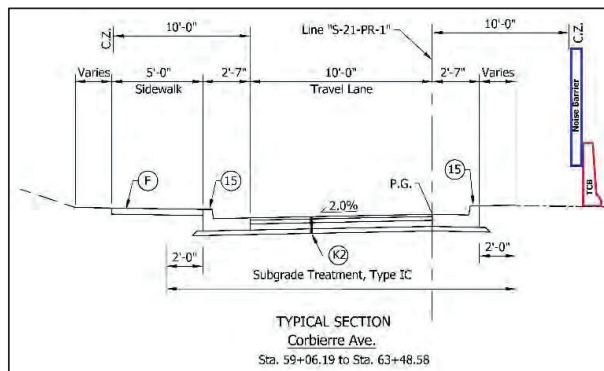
Corbierre Avenue typical section with TCB and attached noise barrier wall between Ingle Avenue and Addison Avenue
